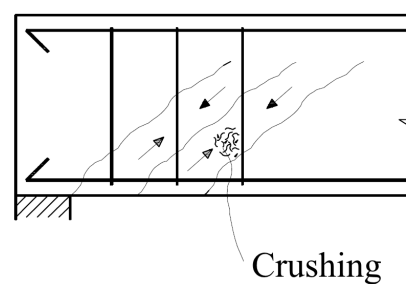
Web shear compression failure of RC beam with shear reinforcement (Al-Emrani et al., 2013).
